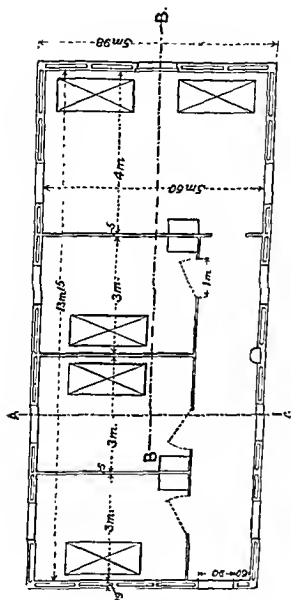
Isolation Pavilion, l'Hôpital des Enfants Malades, Paris (Ground Plan).
